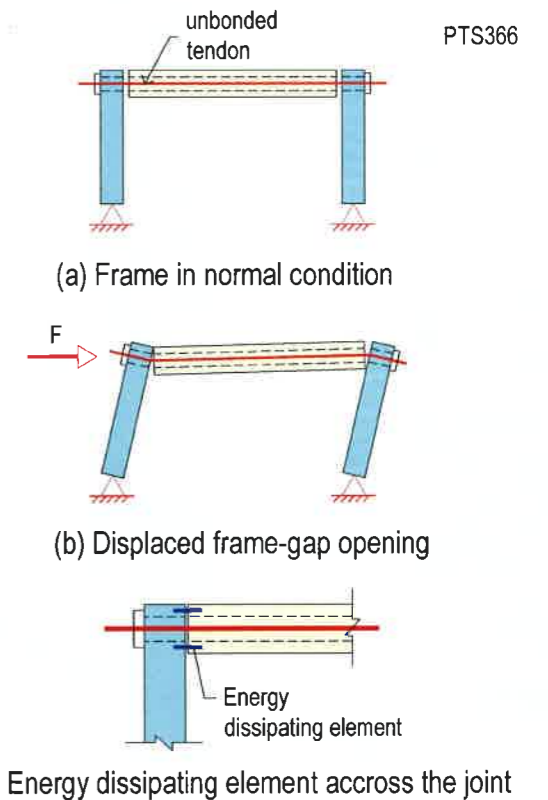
B-4 Details of Externally Applied Post-Tensioning
